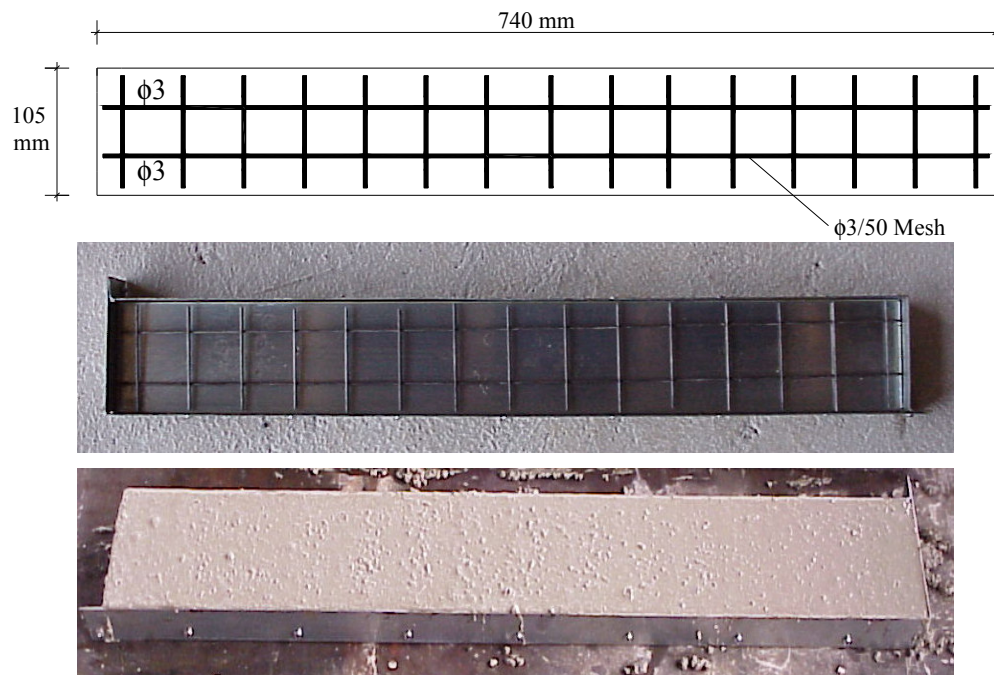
Dimension, reinforcement and moulding of Type D panels
